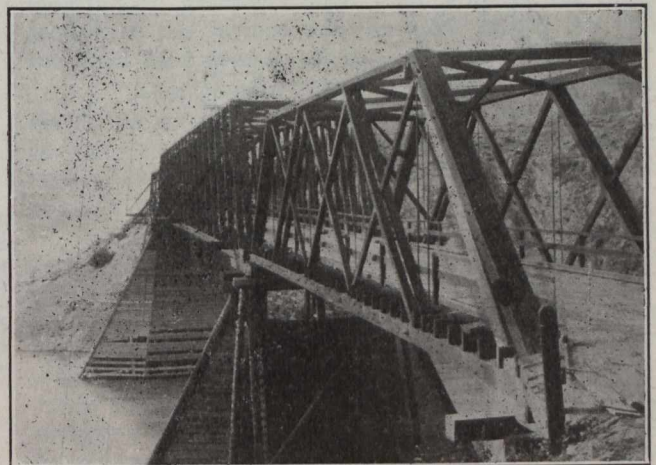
Bridge at Lytton, B.C., Which is Being Replaced.
